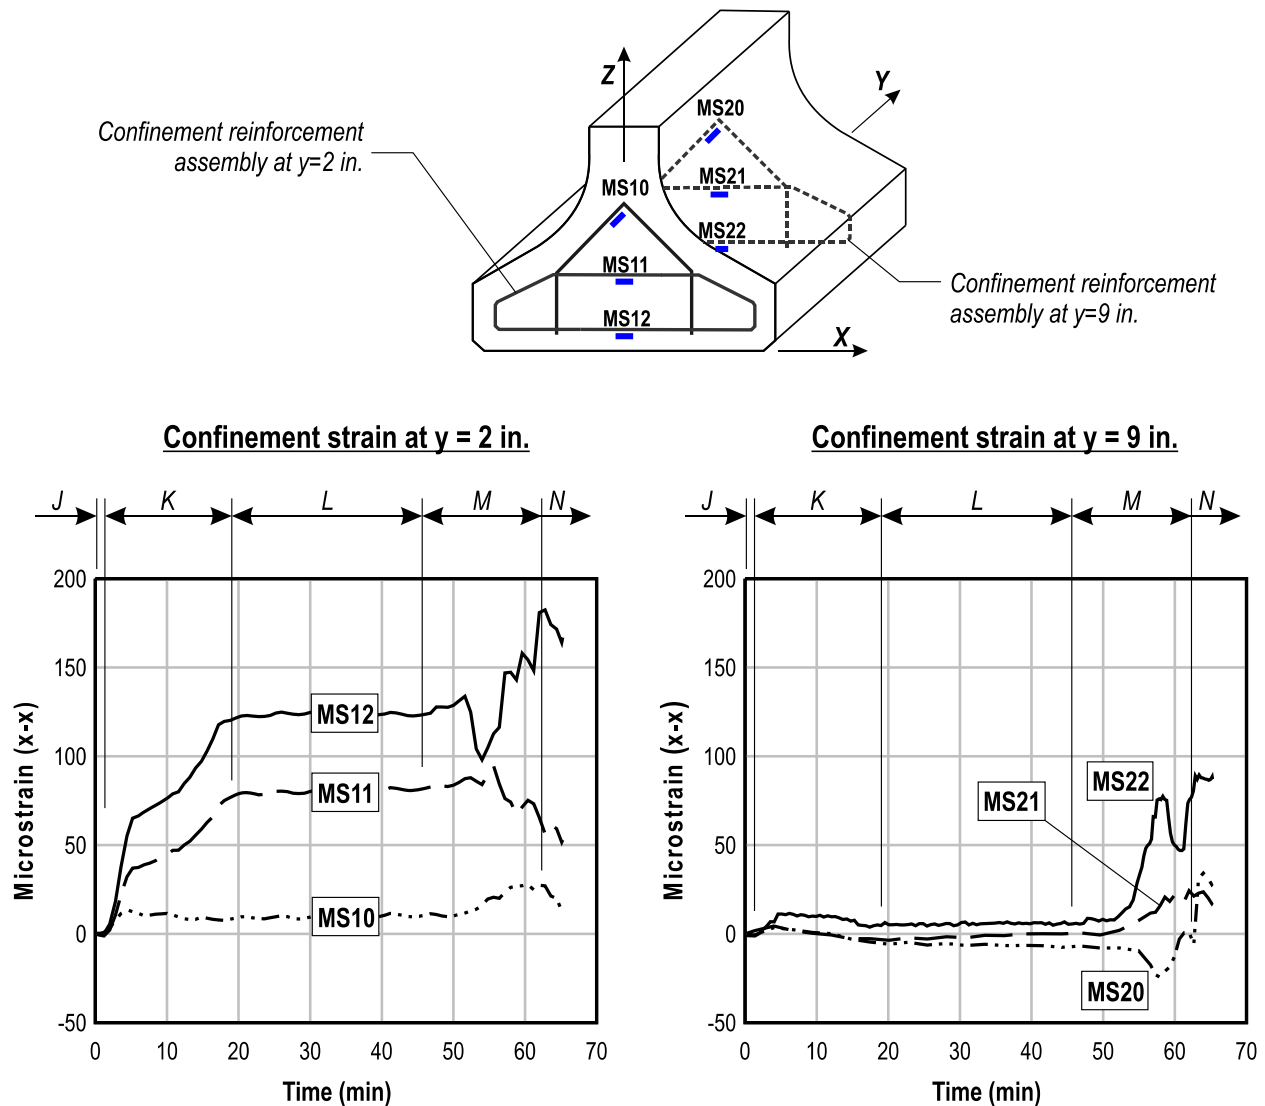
WN Confinement reinforcement strain at 2 in. and 9 in. from end of girder
